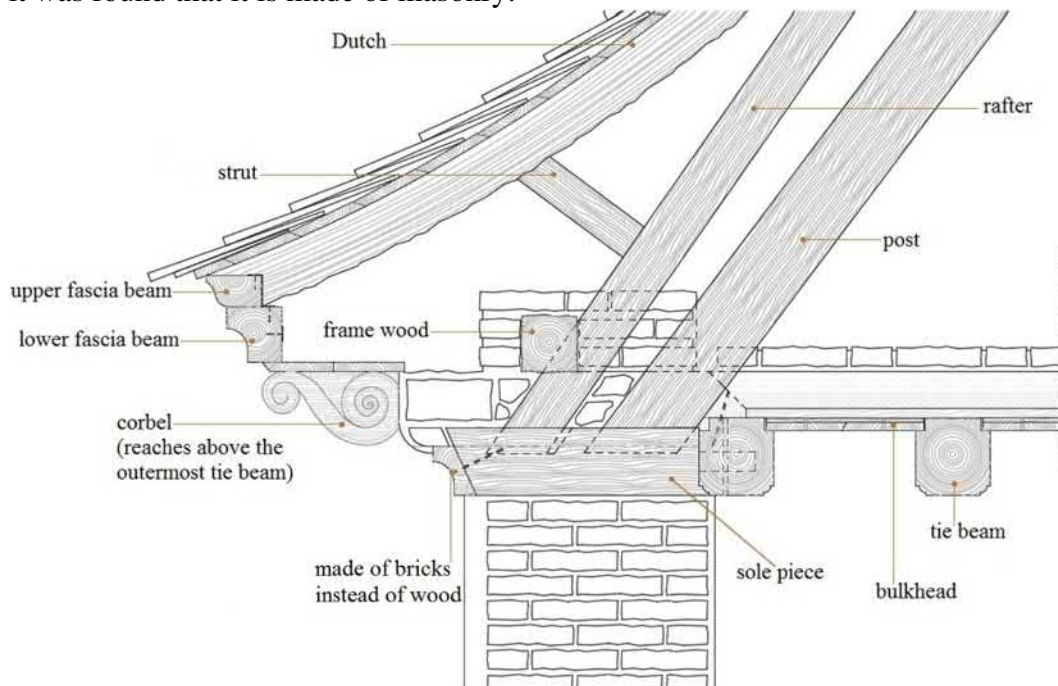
Elevation from the eave structure in the shorter side of the roof. Adapted from the original figure. [1, p. 104] The previous inspection assumed that the batten is made of timber, but it was found that the whole façade is made of bricks.
